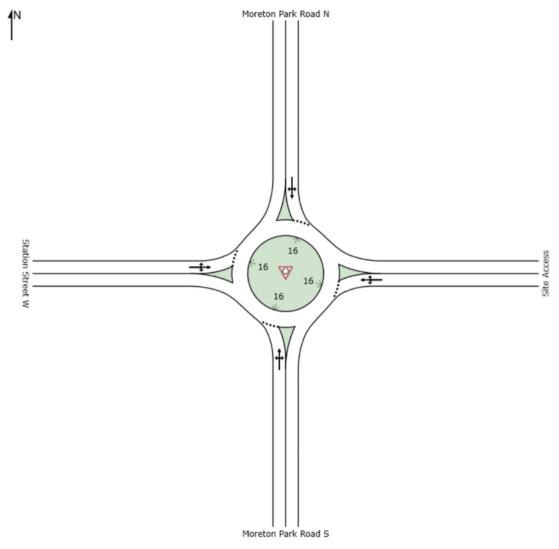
SIDRA Layout for the Future Moreton Park Road / Station Street Intersection
